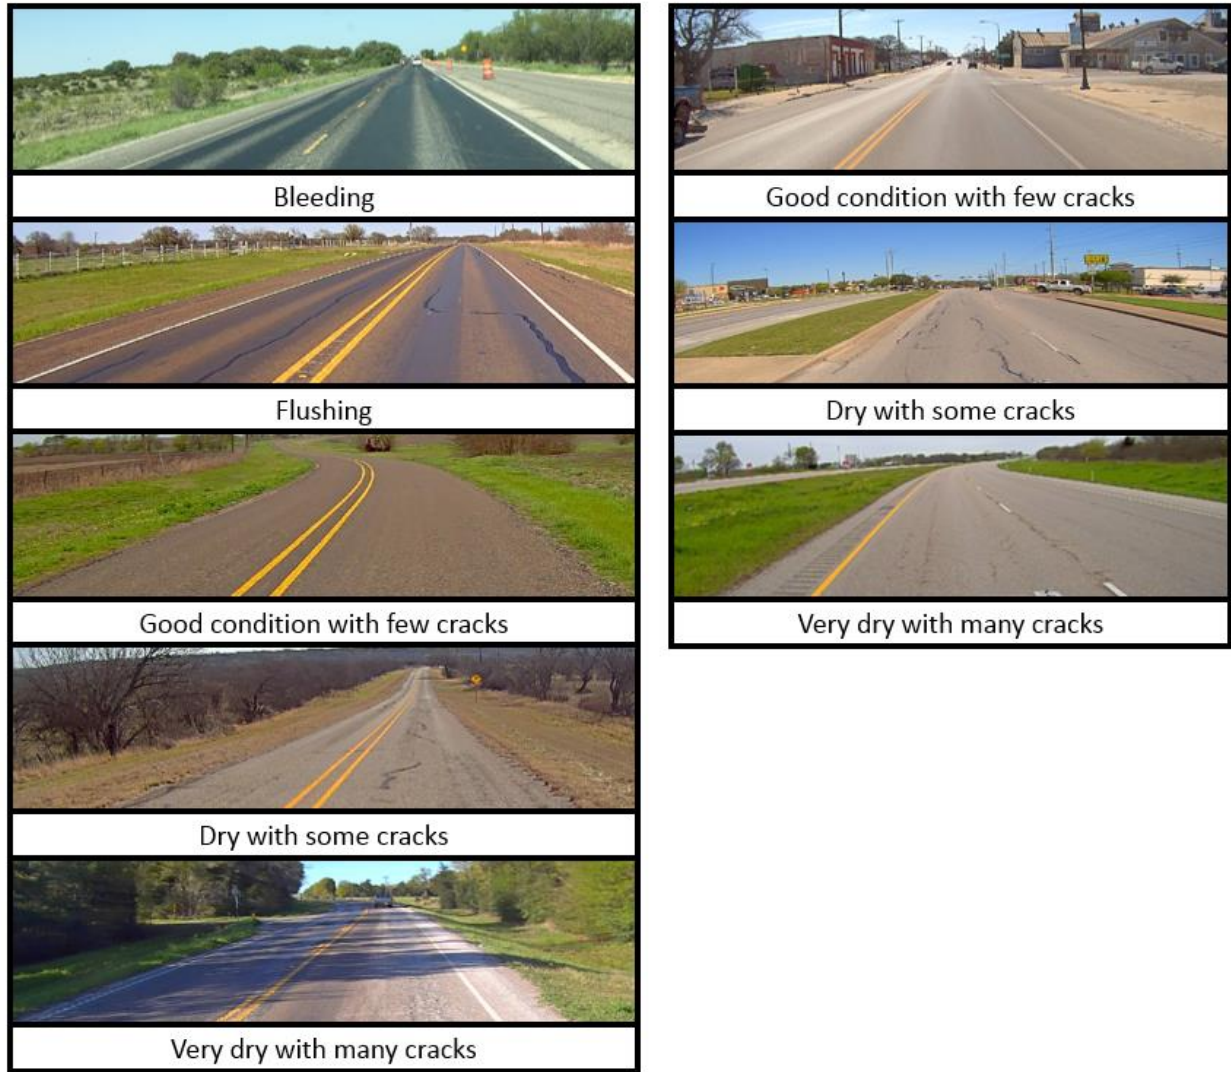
Existing Surfaced Roadways, Pavement Condition.
